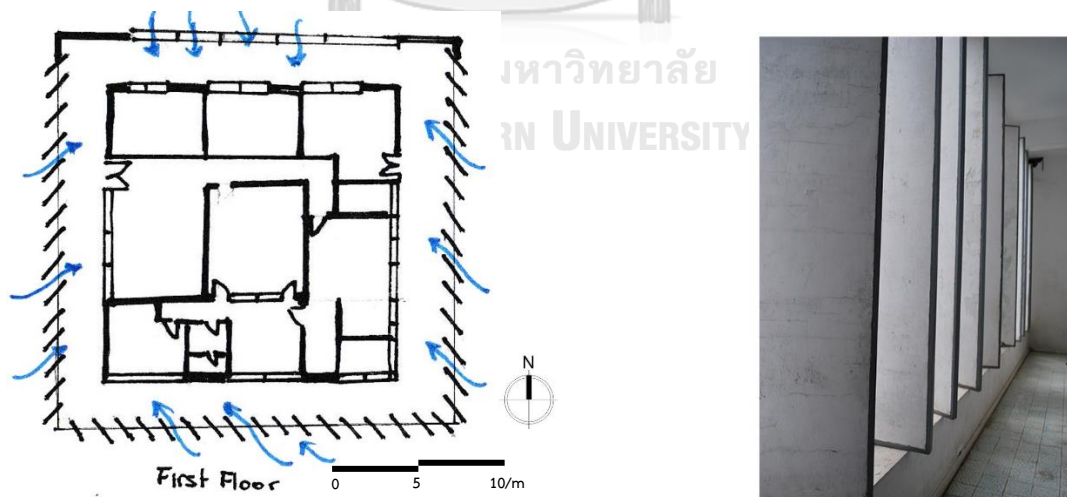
61 Diagram analysis of the first floor plan, designed with a balcony on all sides and vertical shade panels, while the panels can be tilted to allow air and light to enter the space (double wall)
